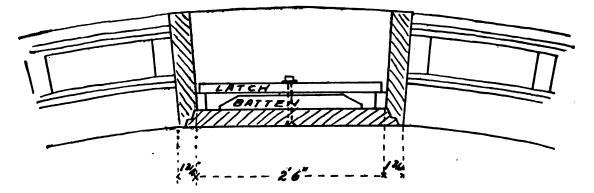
COMBINATION CEMENT SILO (VERTICAL SECTION THROUGH DOOR).
